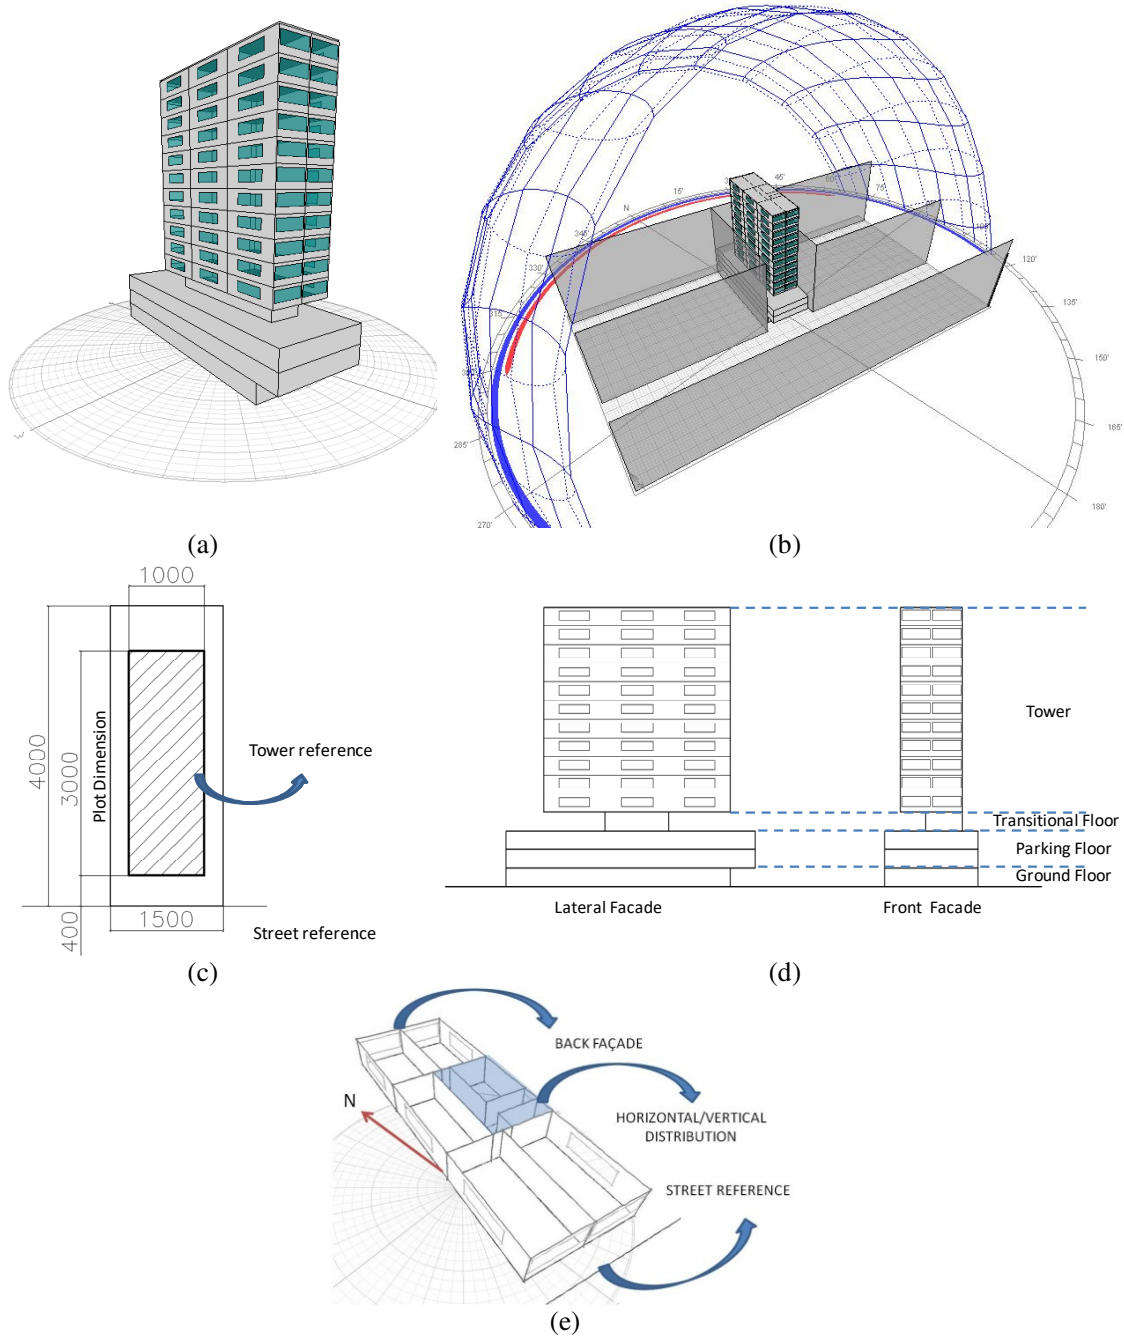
(a) Archetype II geometry, (b) Urban Context, (c) Site plan, (d) Lateral and Front Facade references, (e) Floor Subdivision
